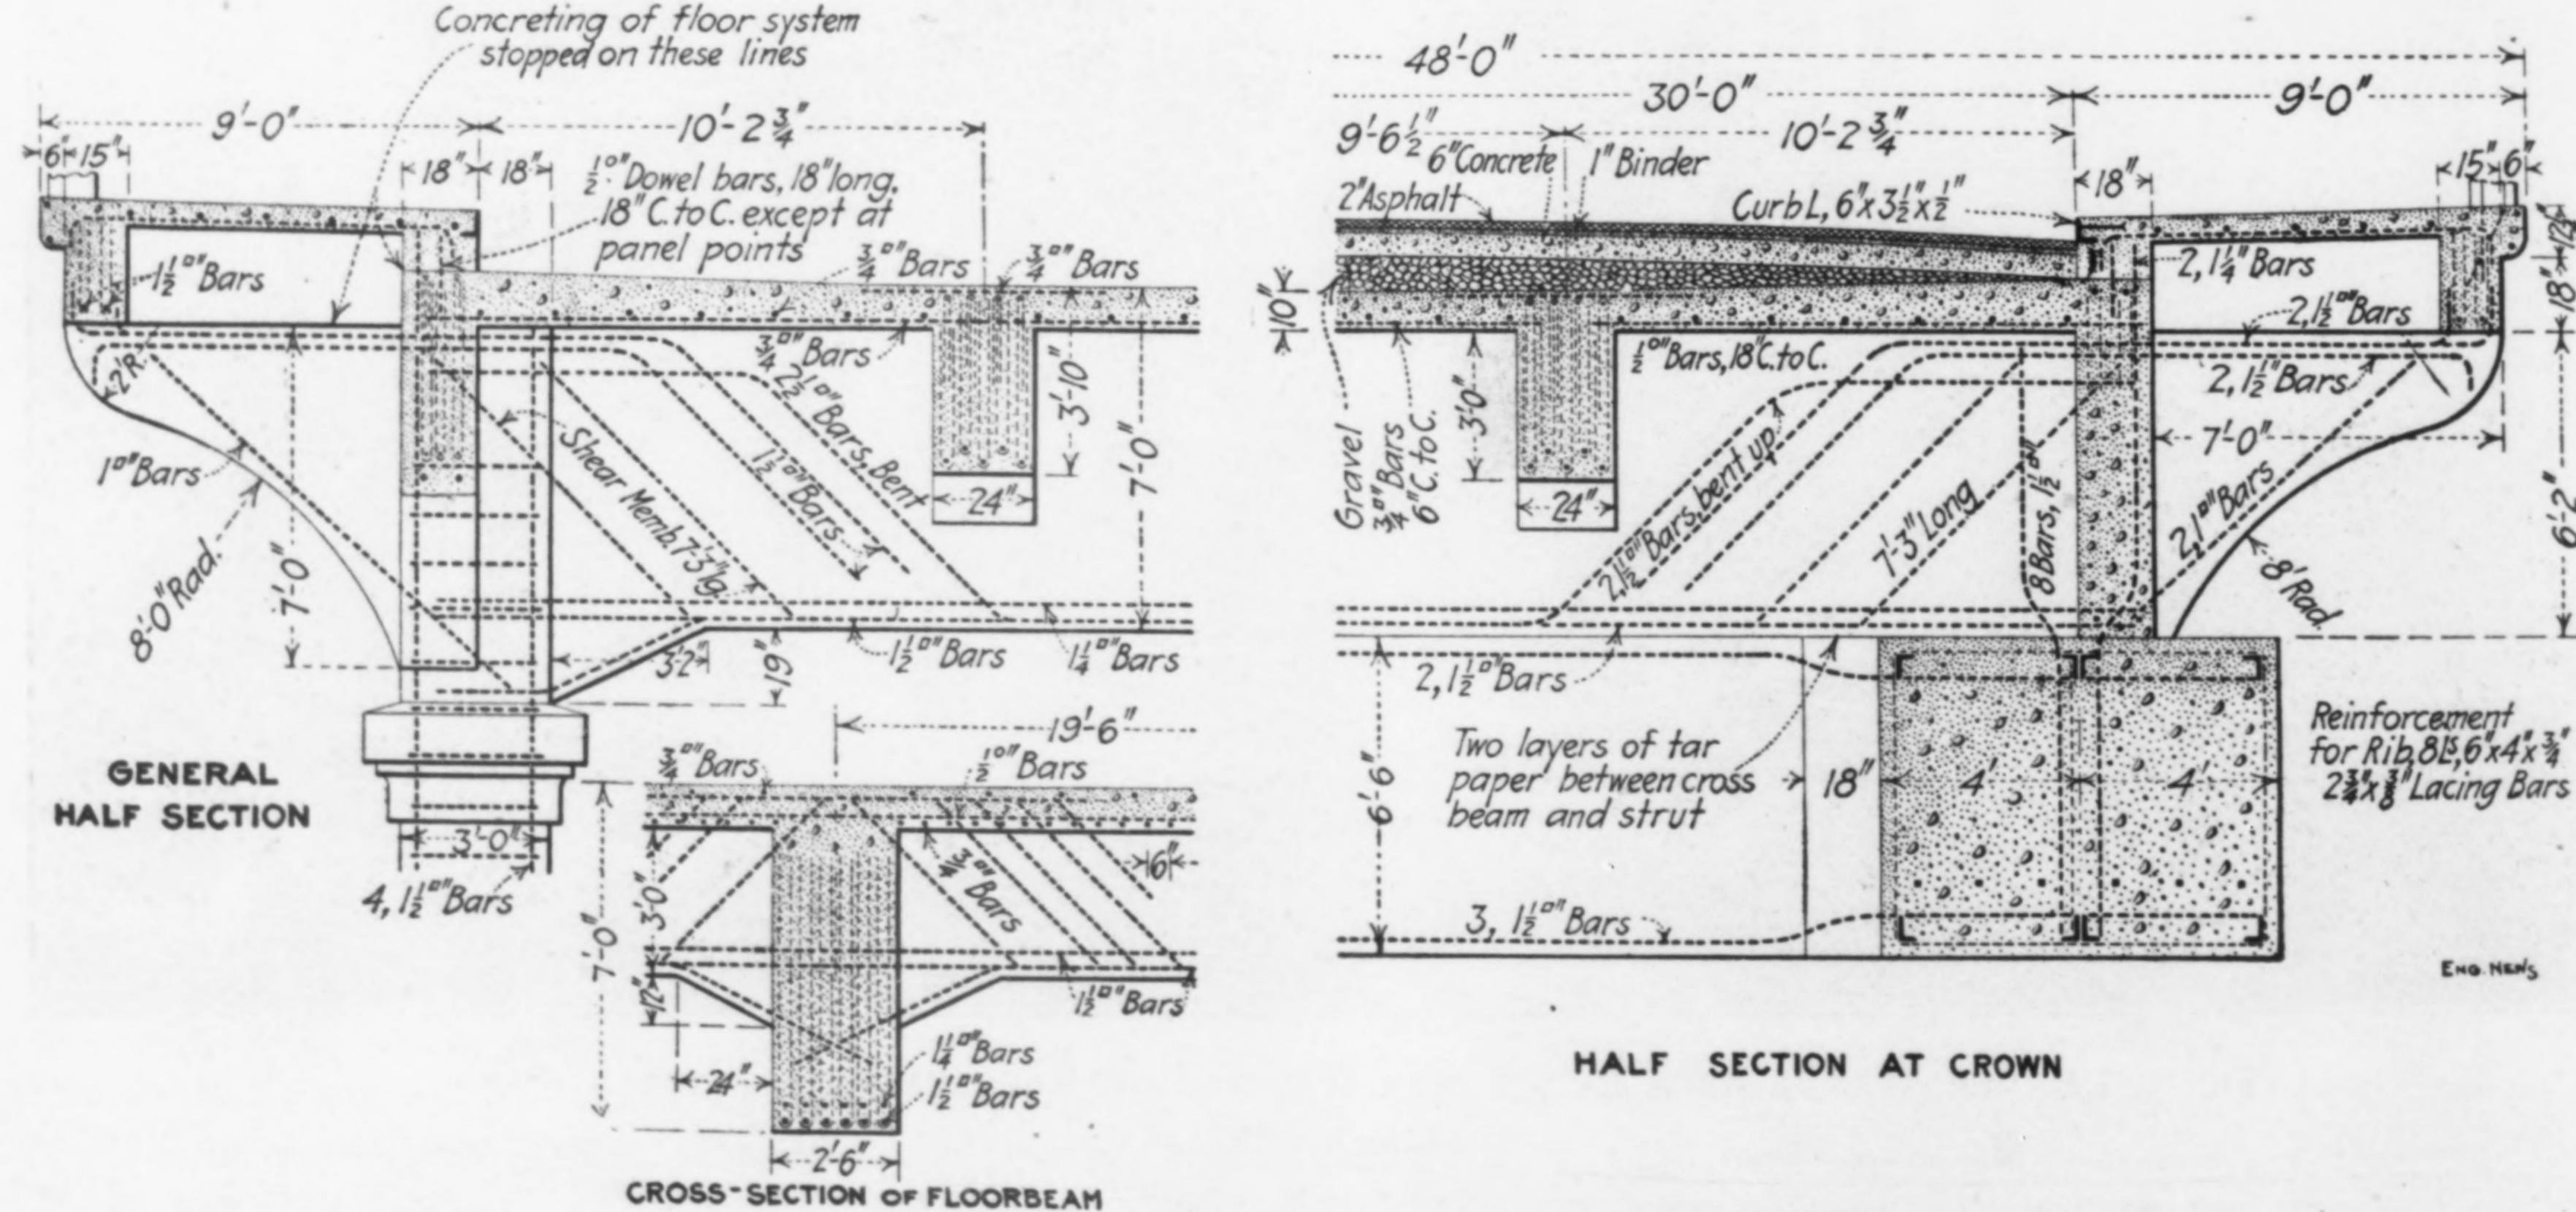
CROSS-SECTION OF DECK, LARIMER AVE. ARCH BRIDGE
